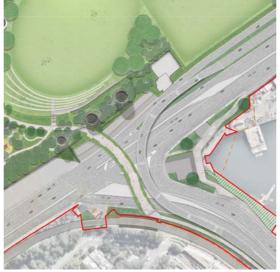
Green Link Bridge and Bridge to Rozelle Bay (subject to approval of modification SSI-7485-Mod-2)
